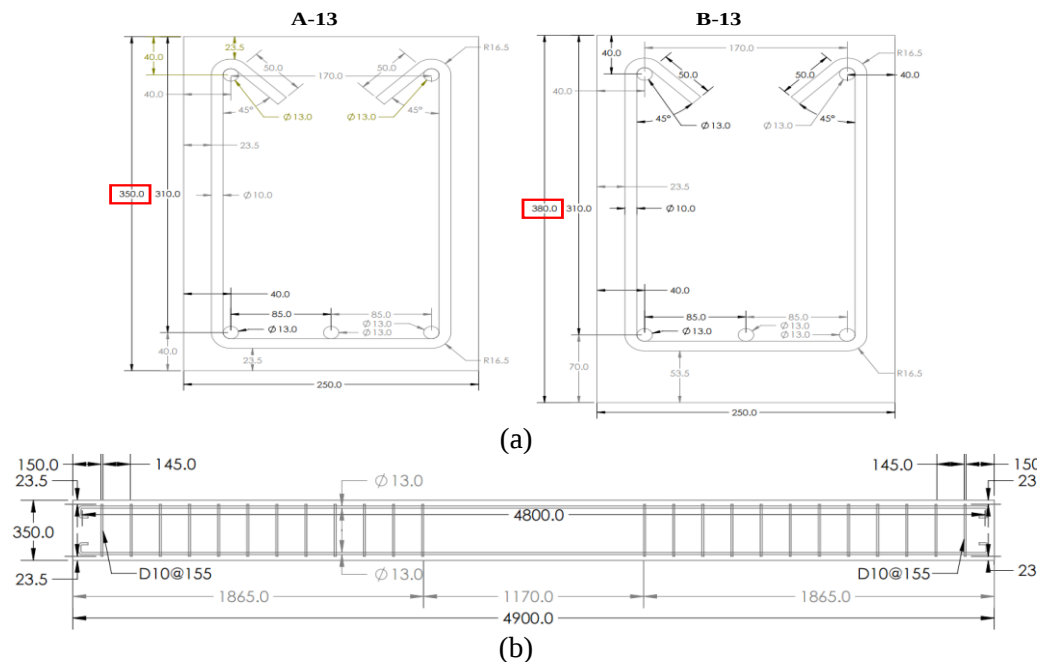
Beam dimensions (in mm): (a) side view; (b) front view
